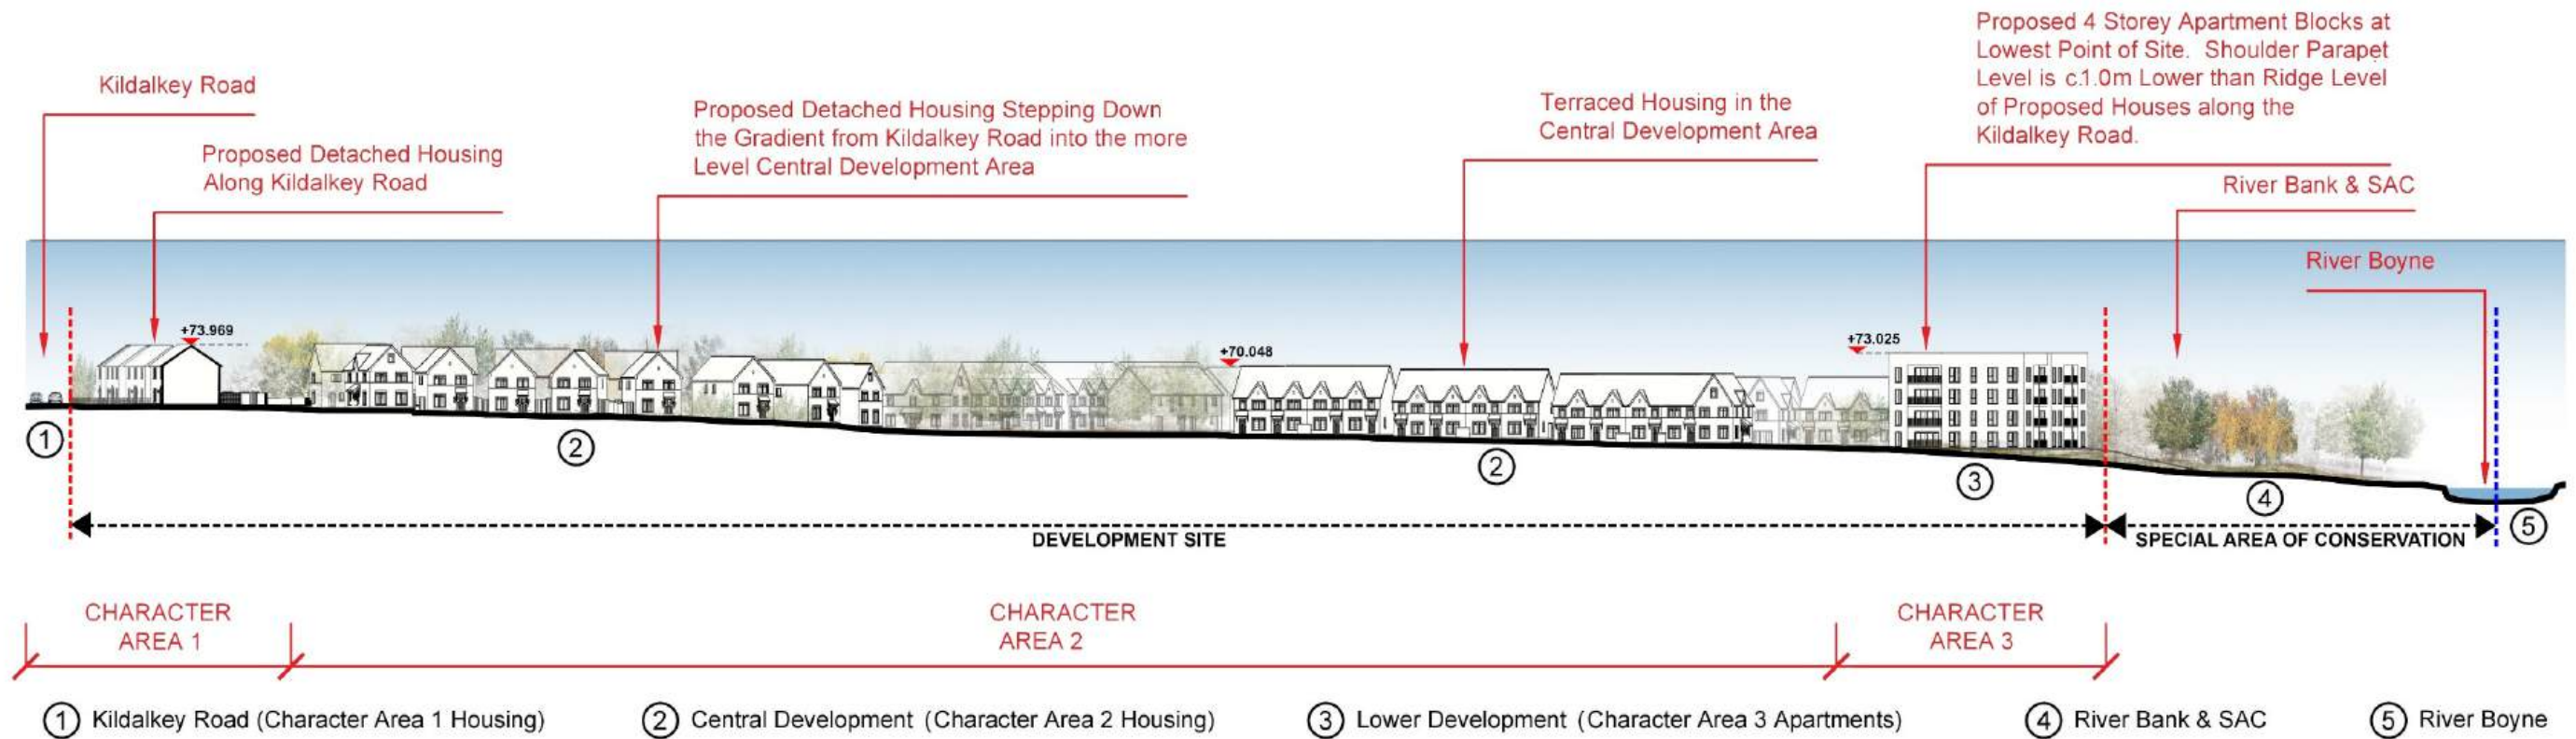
Site Section through site looking East (existing ground levels to be preserved as much as possible)
